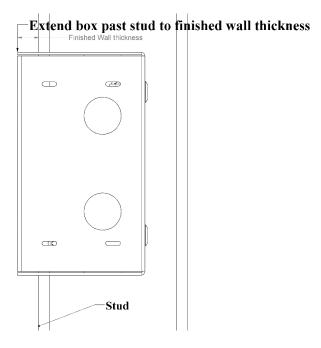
Flush Mount Installation (Protrude to finished wall thickness)
